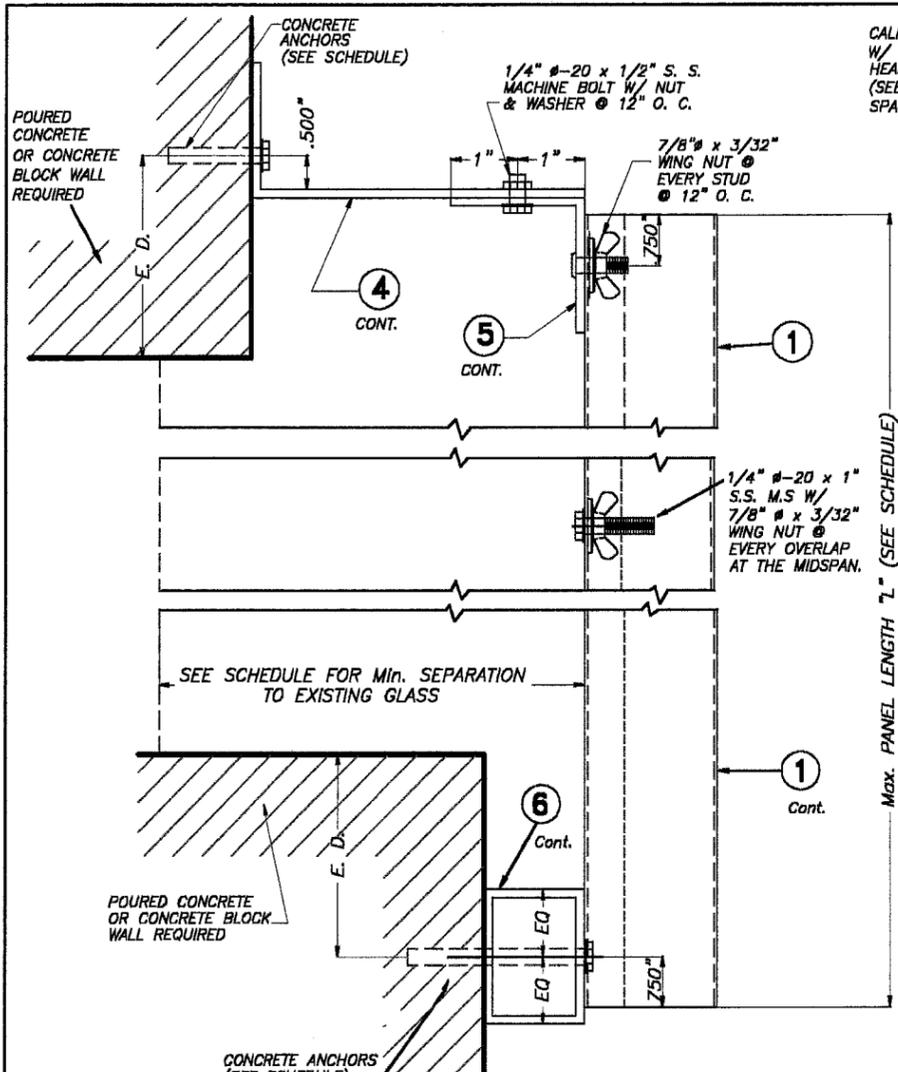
INSTALLATION OF 1/4" x 1" SIDEWALK BOLTS @ REMOVABLE PANEL
